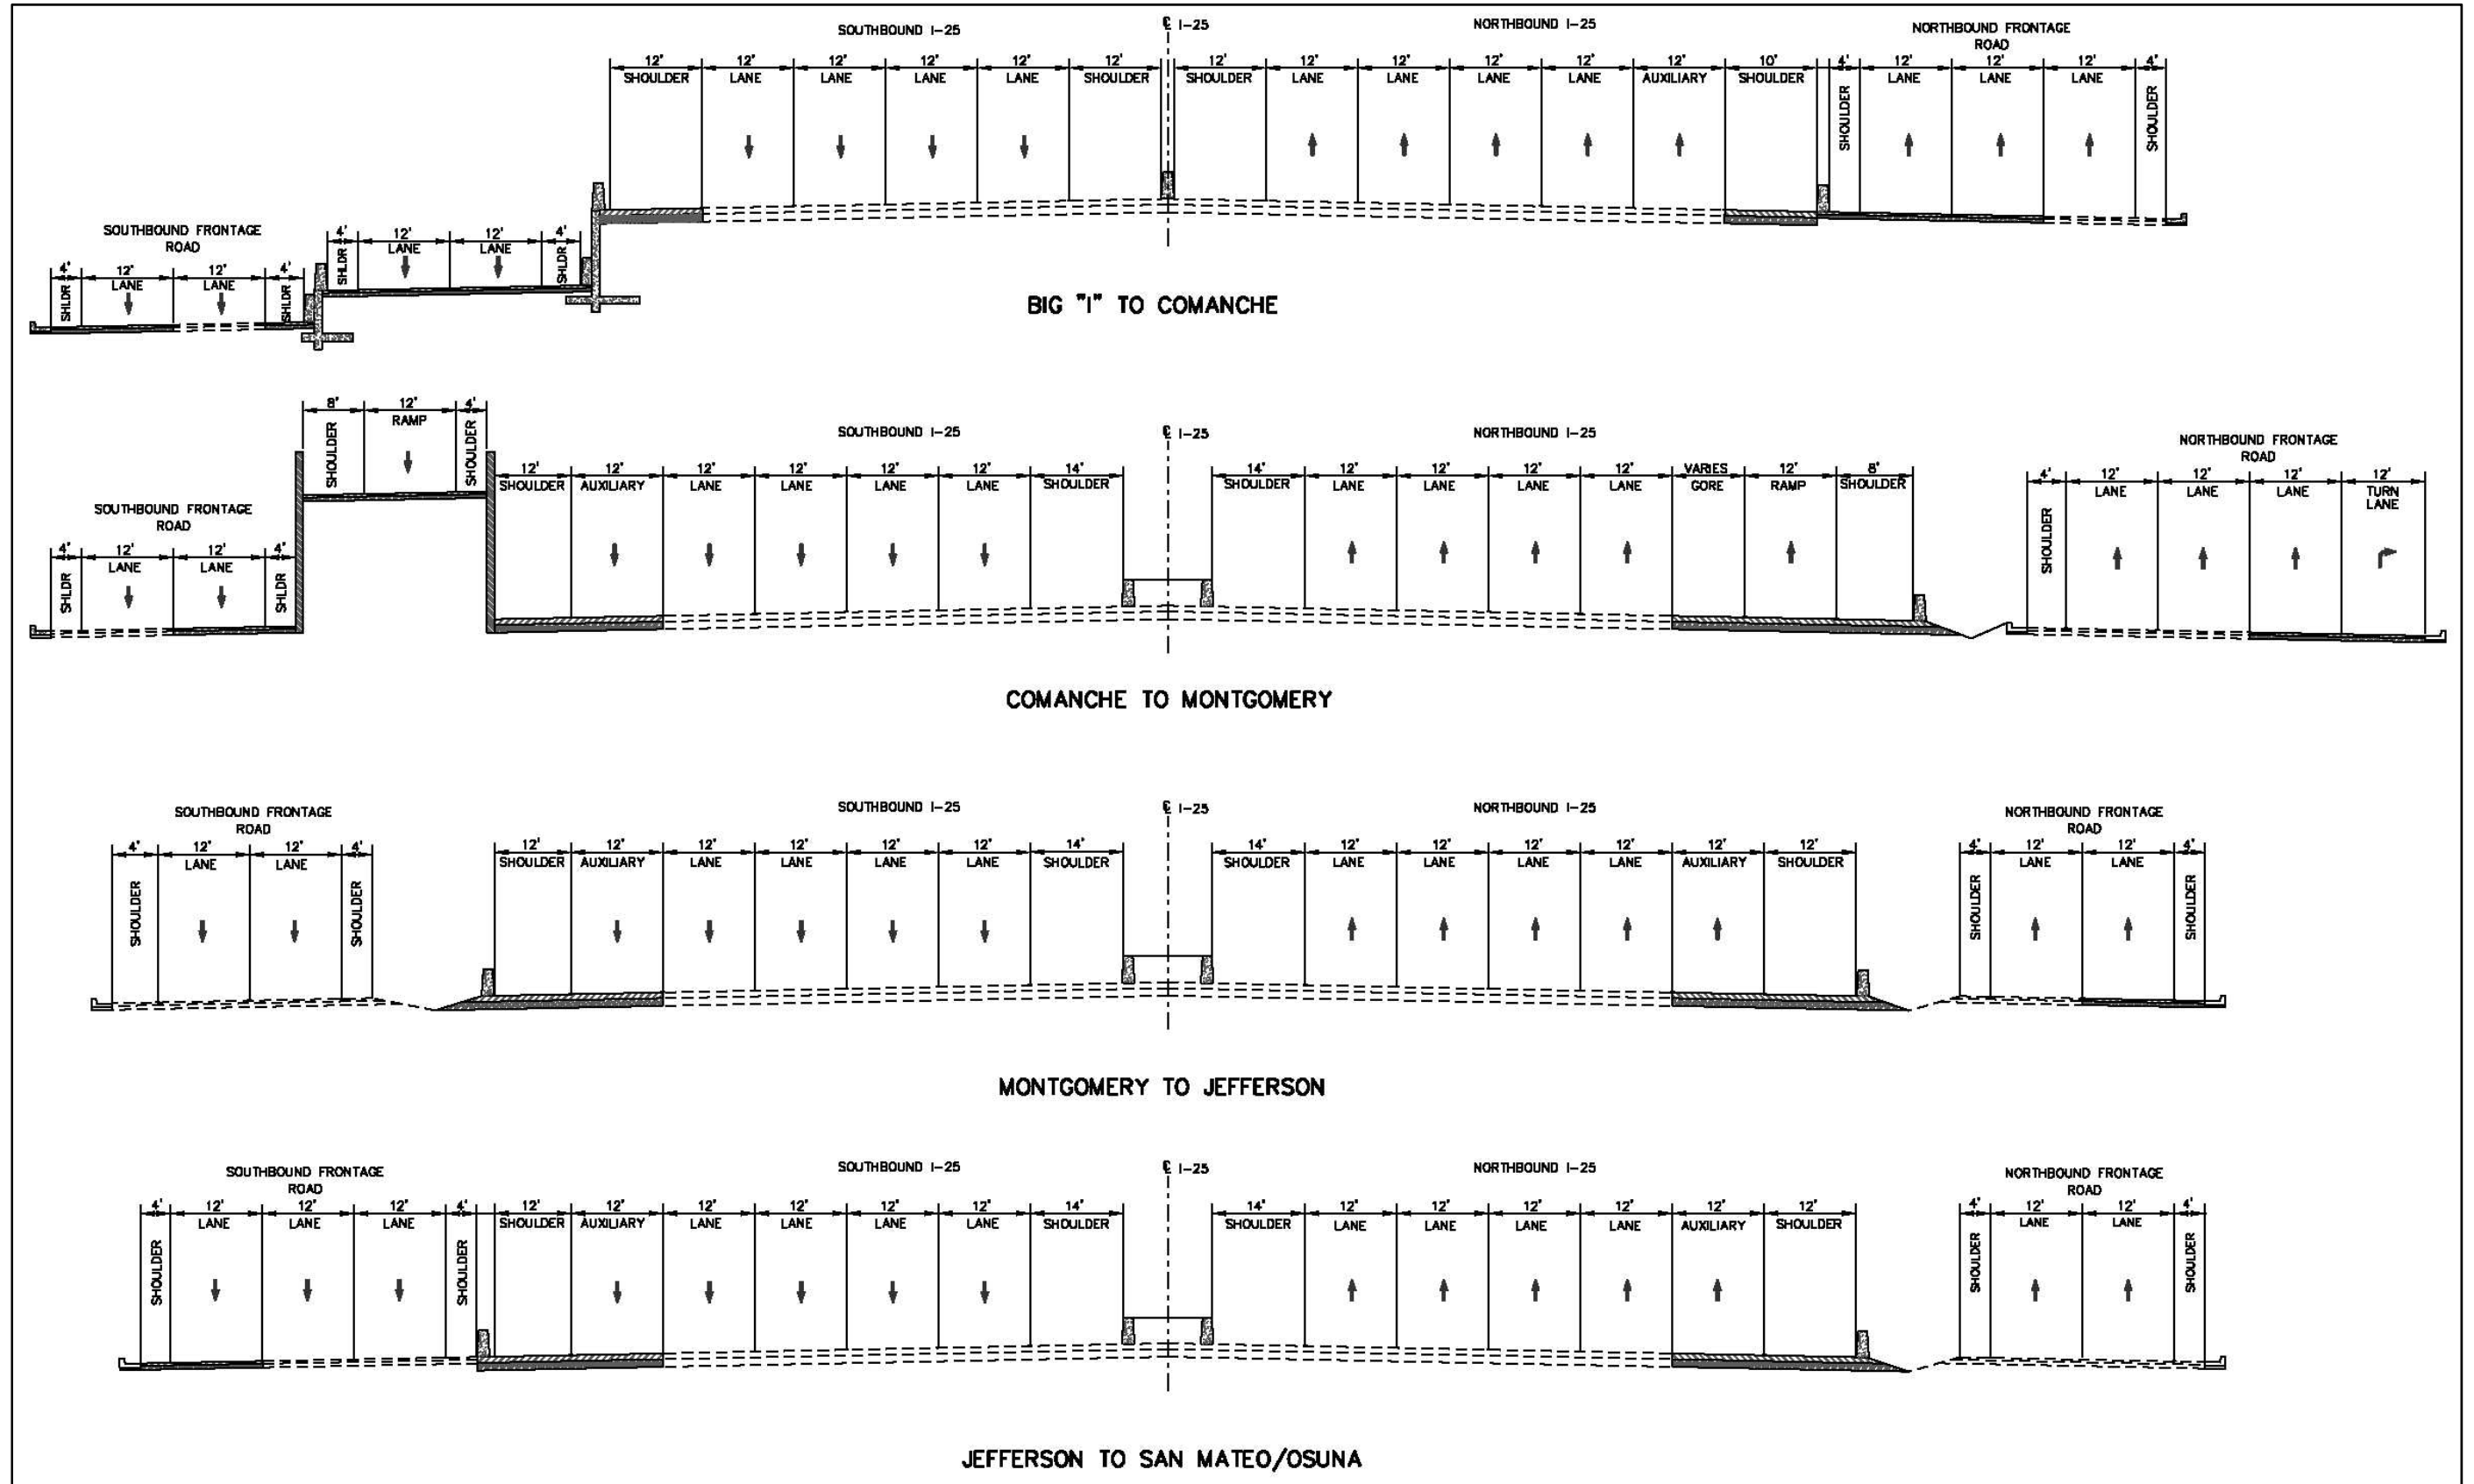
, Recommended Build Alternative Typical Sections along North I-25
